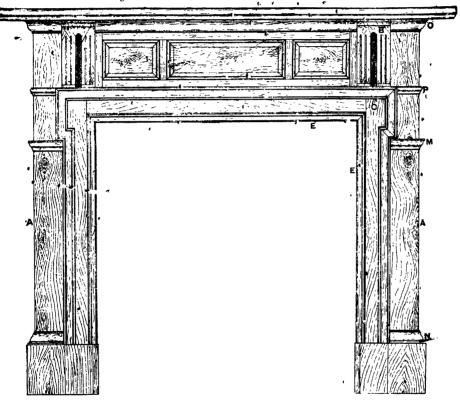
Front Elevation of Chimney-piece Ornamented with Mouldings.
